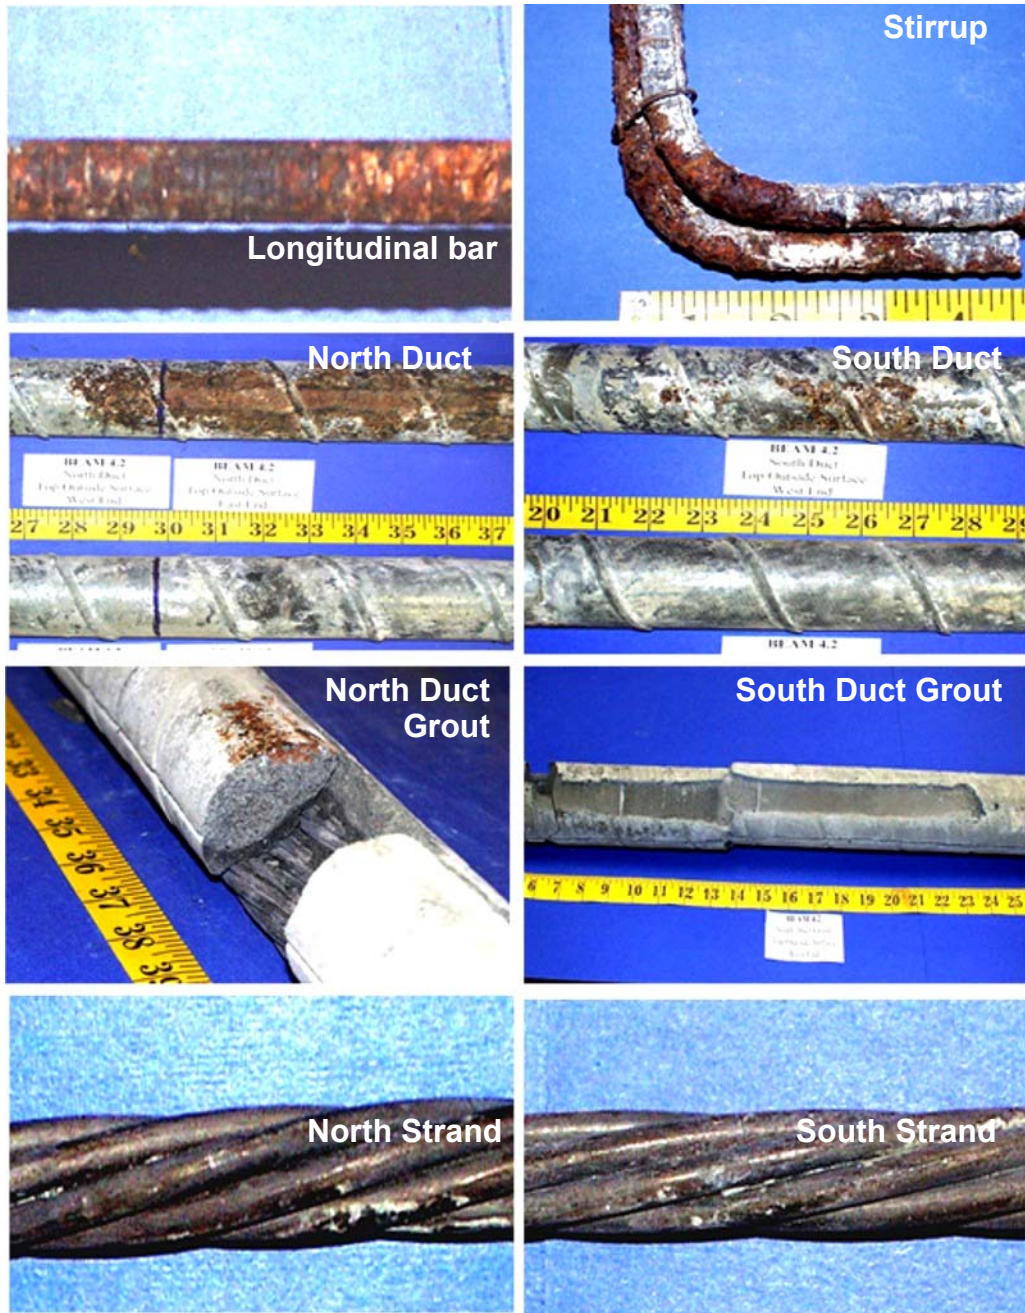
Specimen 4.2 – Reinforcing Elements
